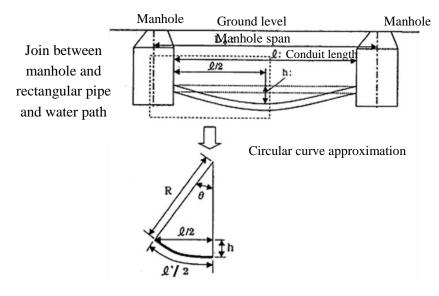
the pulling out length and ground settlement due to liquefaction (for PVC pipe with adhesive joints)
